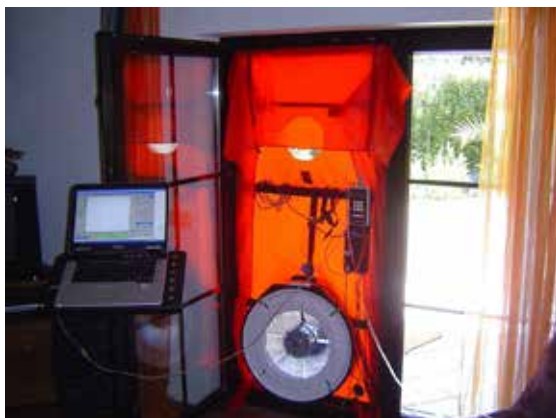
Blower door test (Source: Wikipedia Commons)
